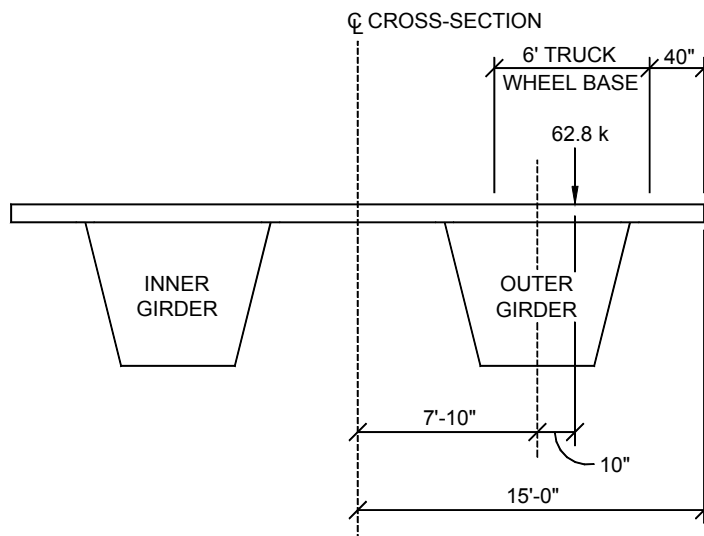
Live Load Test Setup on Bridge K (Outer Run)
